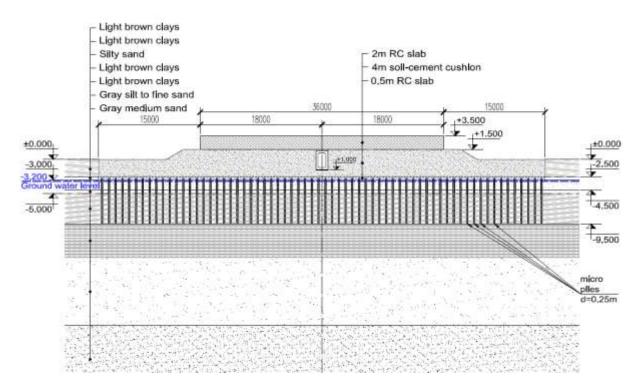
Foundation improvement for the ATDF Disposal Zone
